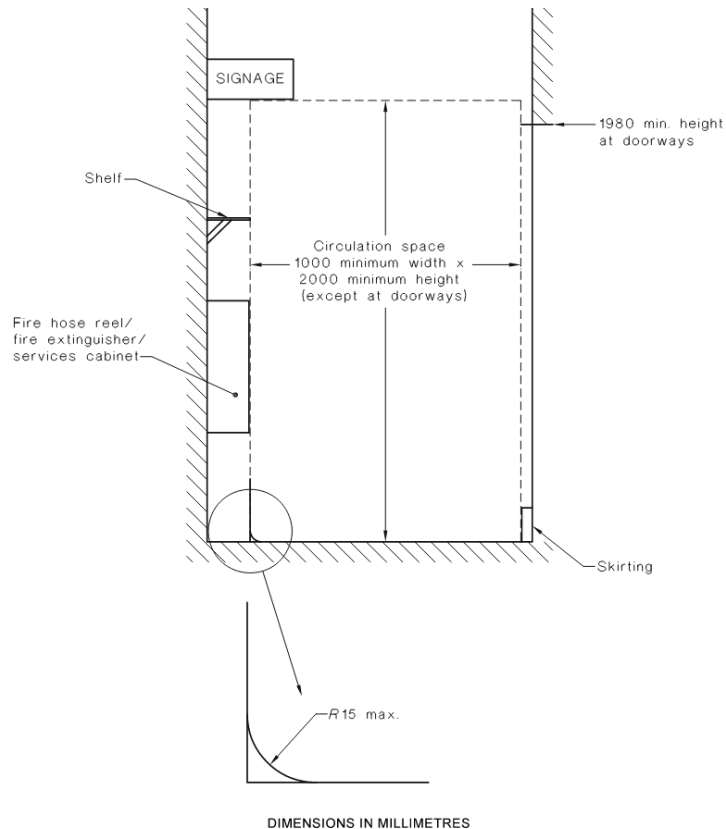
CONTINUOUS ACCESSIBLE PATH OF TRAVEL—MINIMUM HEIGHT AND WIDTH
